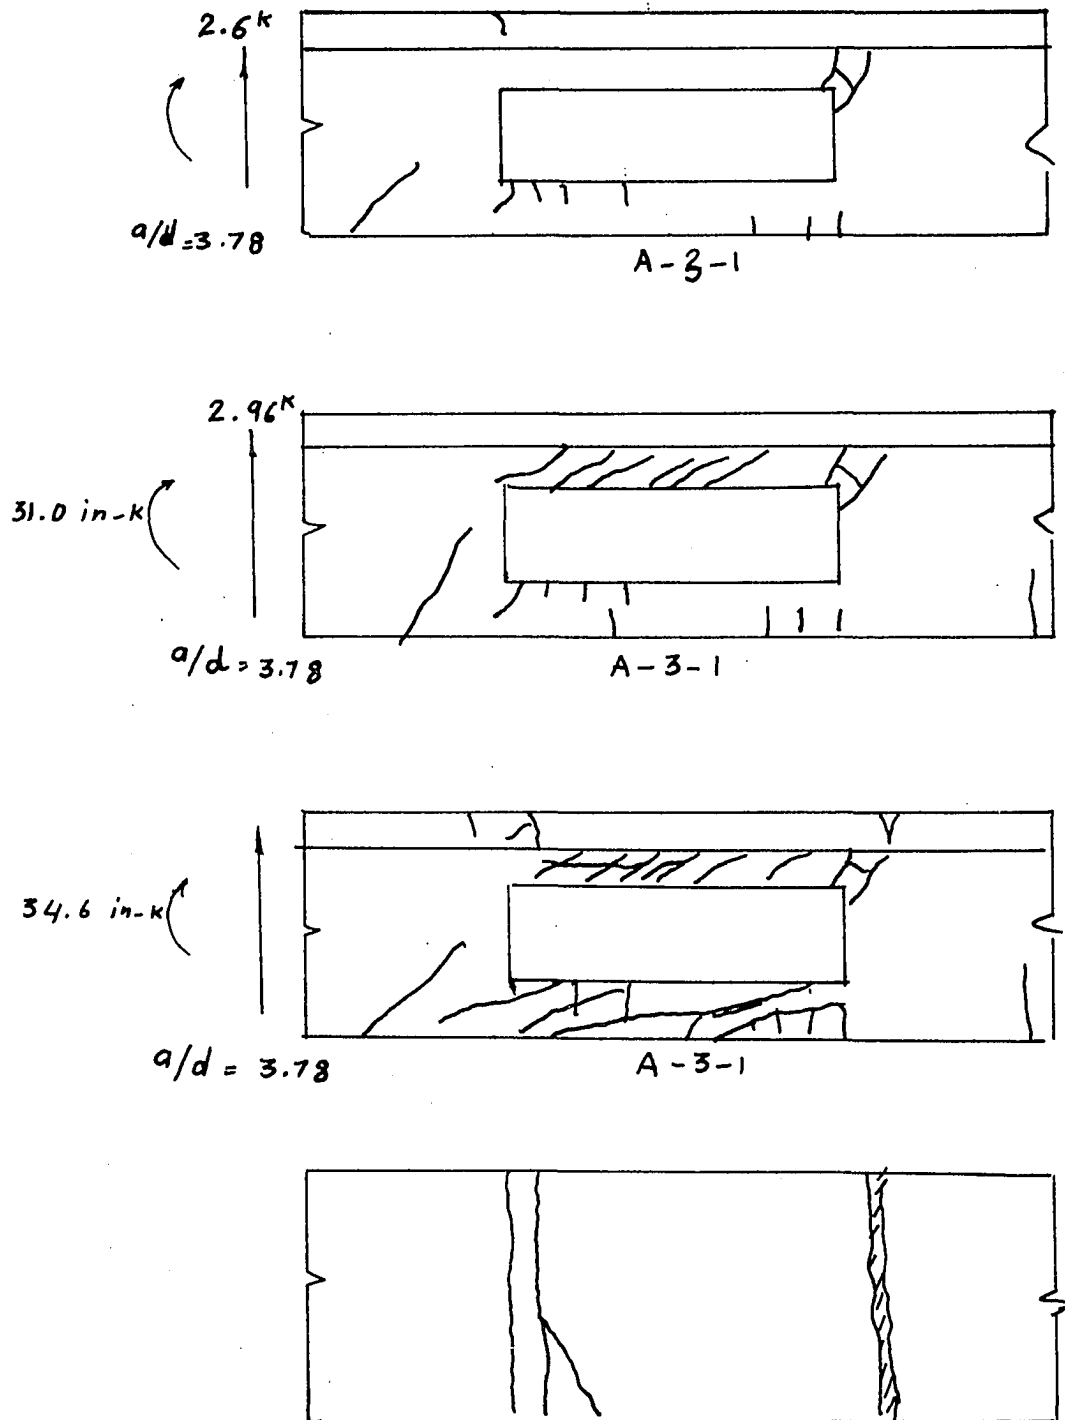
Cracking Versus Bending Moment and Shearing Force Around the Opening of Beam A-3-1.
